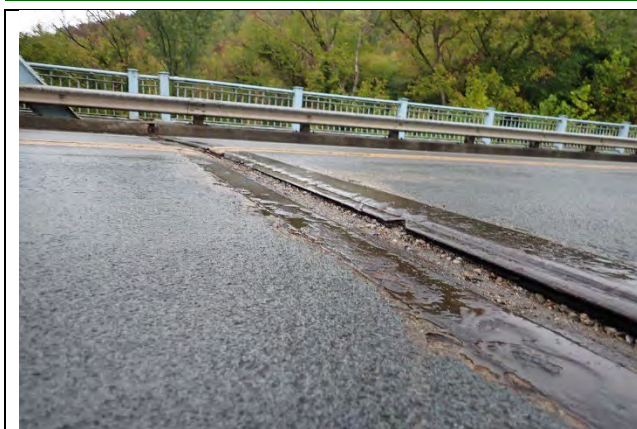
View of the sunken joint seal over Pier 2 on the south end.
